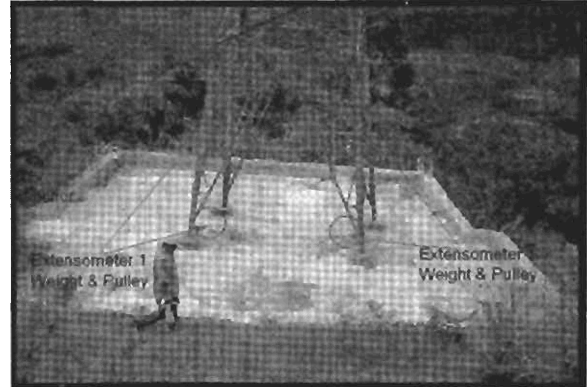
Location of landslide monitoring equipment at Tower 7, South Sambaloran.
